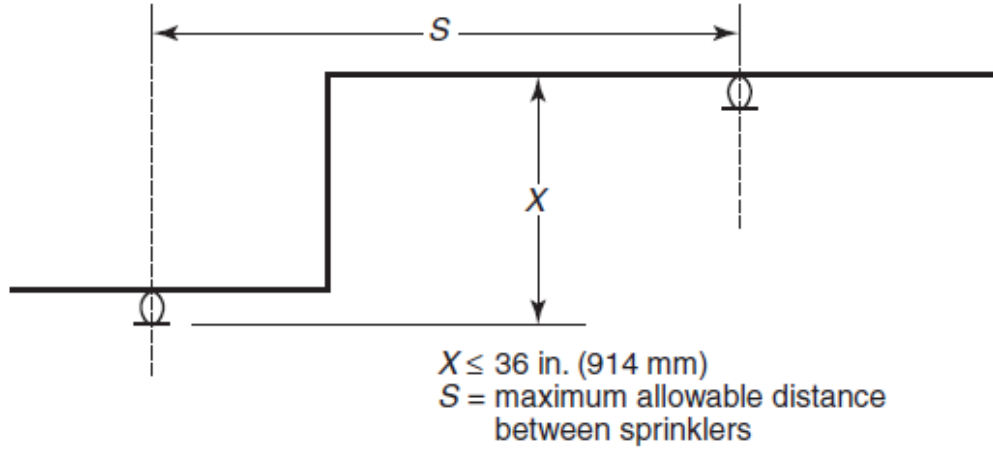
(B) Vertical Change in Ceiling Elevation Less Than or Equal to 36 in. (914 mm).
